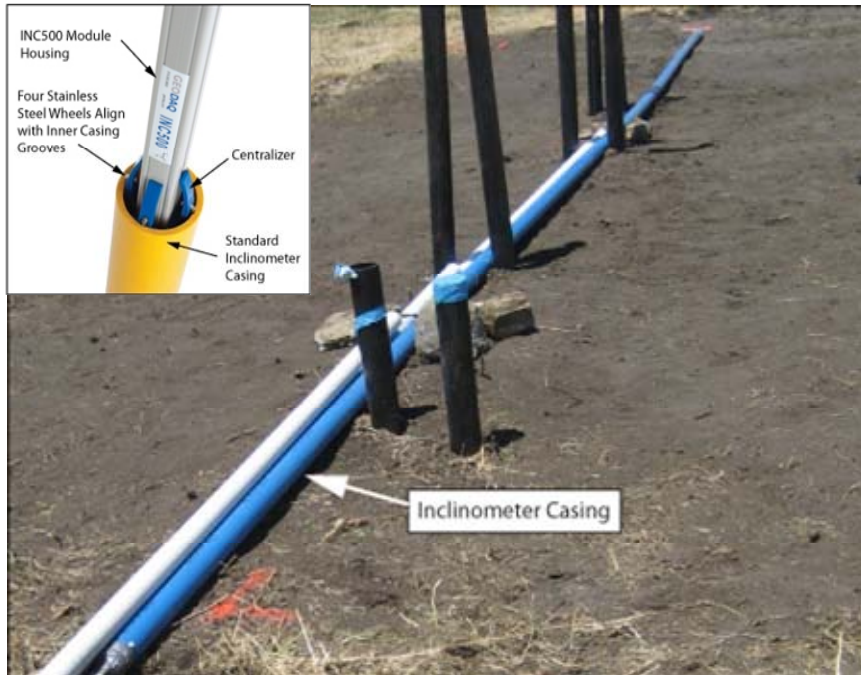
Inclinometer casing on ground surface prior to levee construction, and INC500 instrumentation detail.
